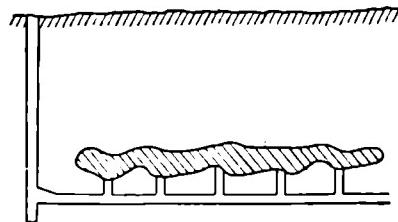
Opening up of a deposit through mine workings driven in country rock
